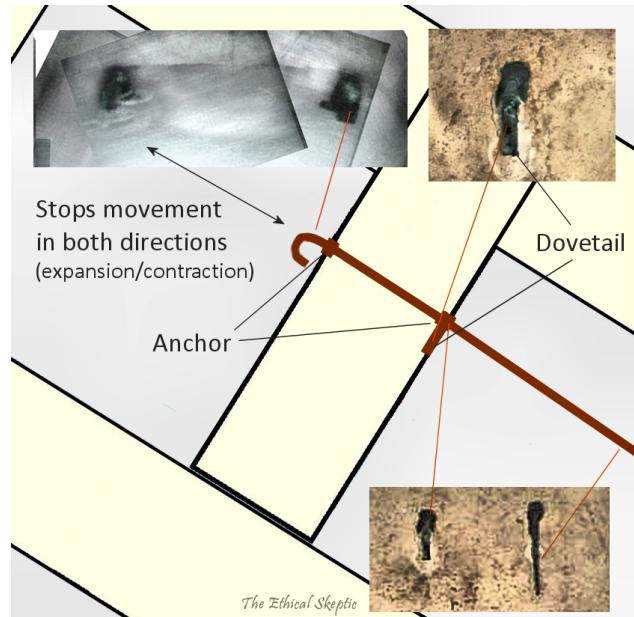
Longitudinal cross section of shaft end door and expansion/contraction anchoring, dovetailing, and stopping.
